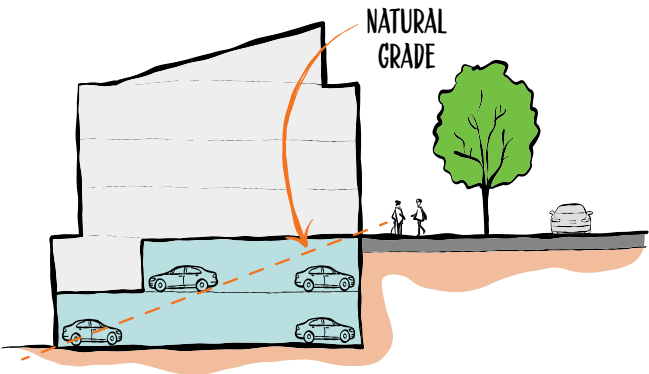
Design buildings to adapt to up-slope and down-slope conditions relative to the street.
